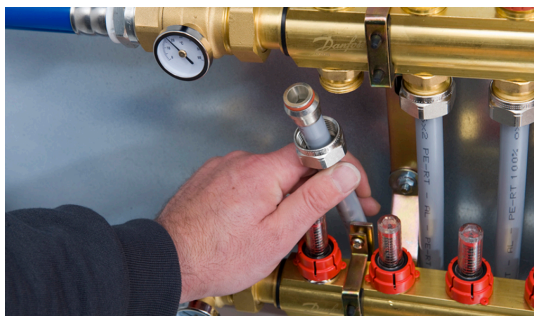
Slip compression fitting nut over FH composite pipe and push down fitting insert (Eurocone) until it meets end stops.
